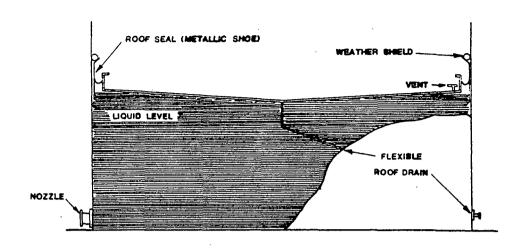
PAN-TYPE FLOATING ROOF STORAGE TANK (METALLIC SEALS)
